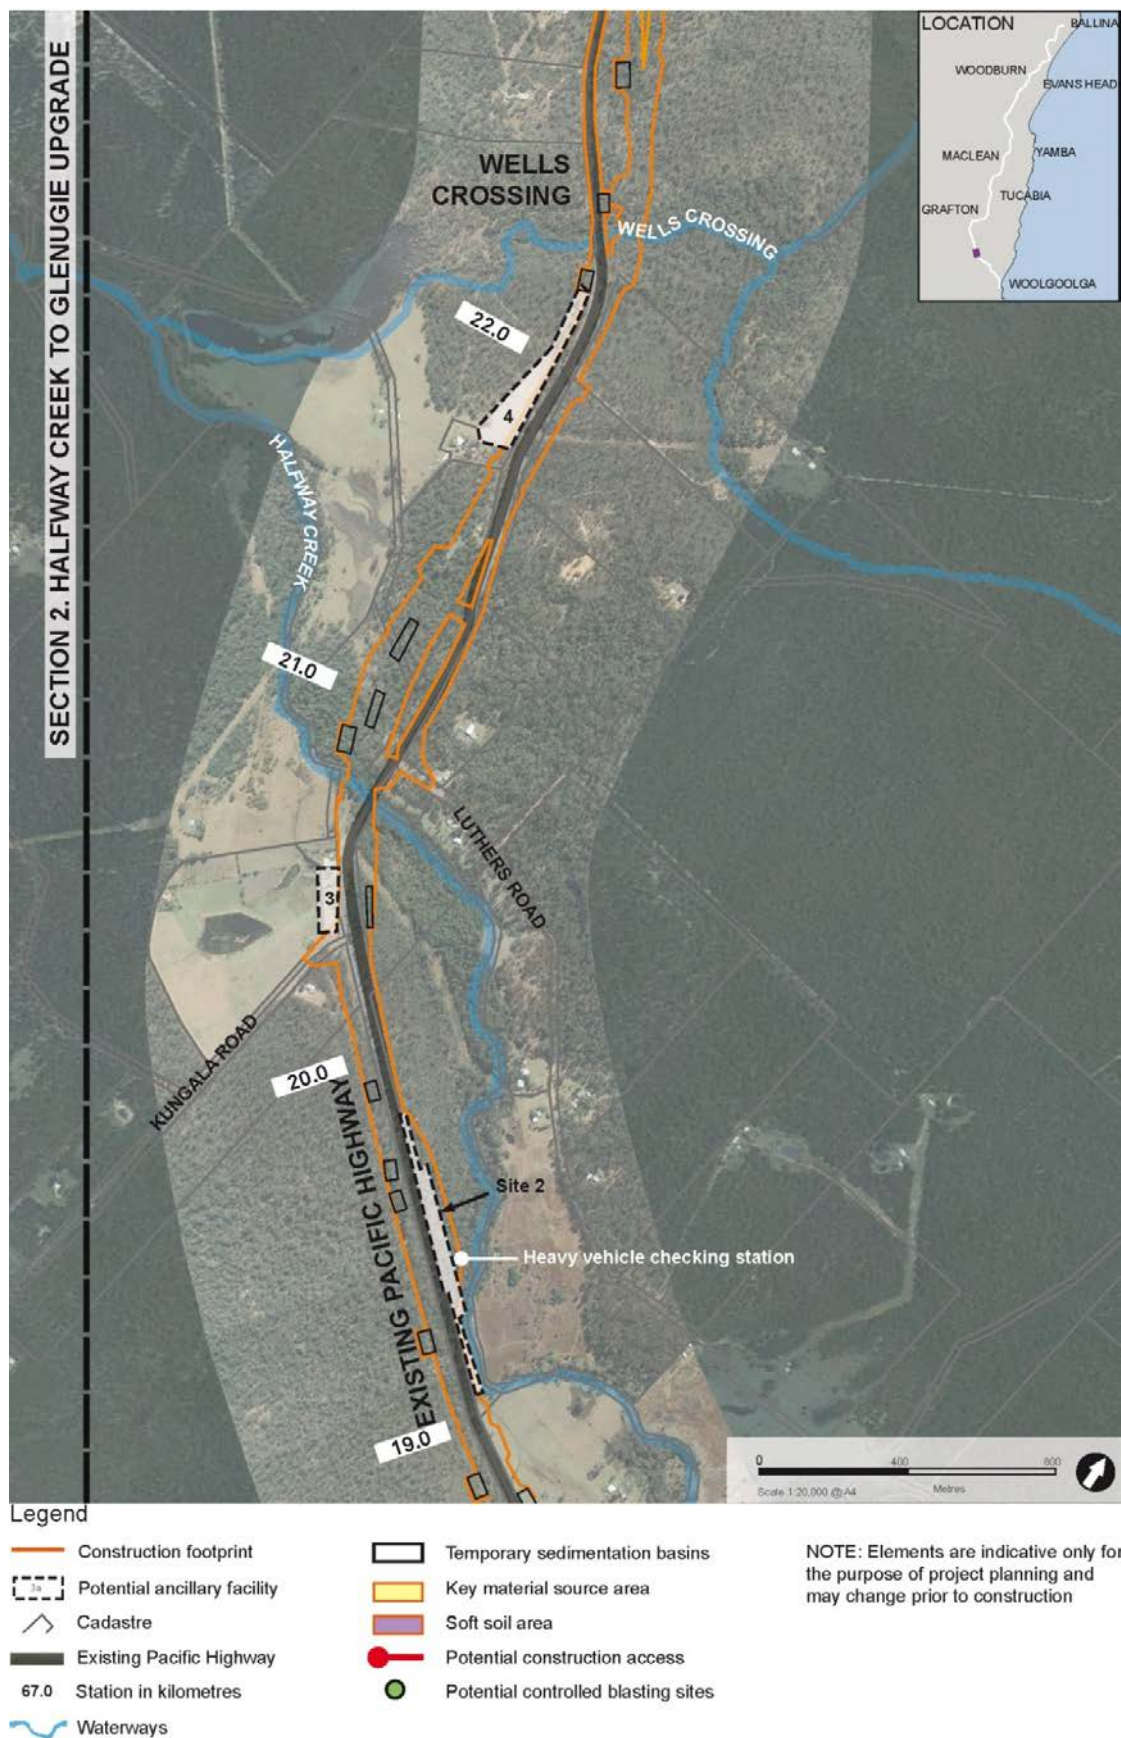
Extent of construction and construction features Section 2 (Station 18.9 to 22.9)
